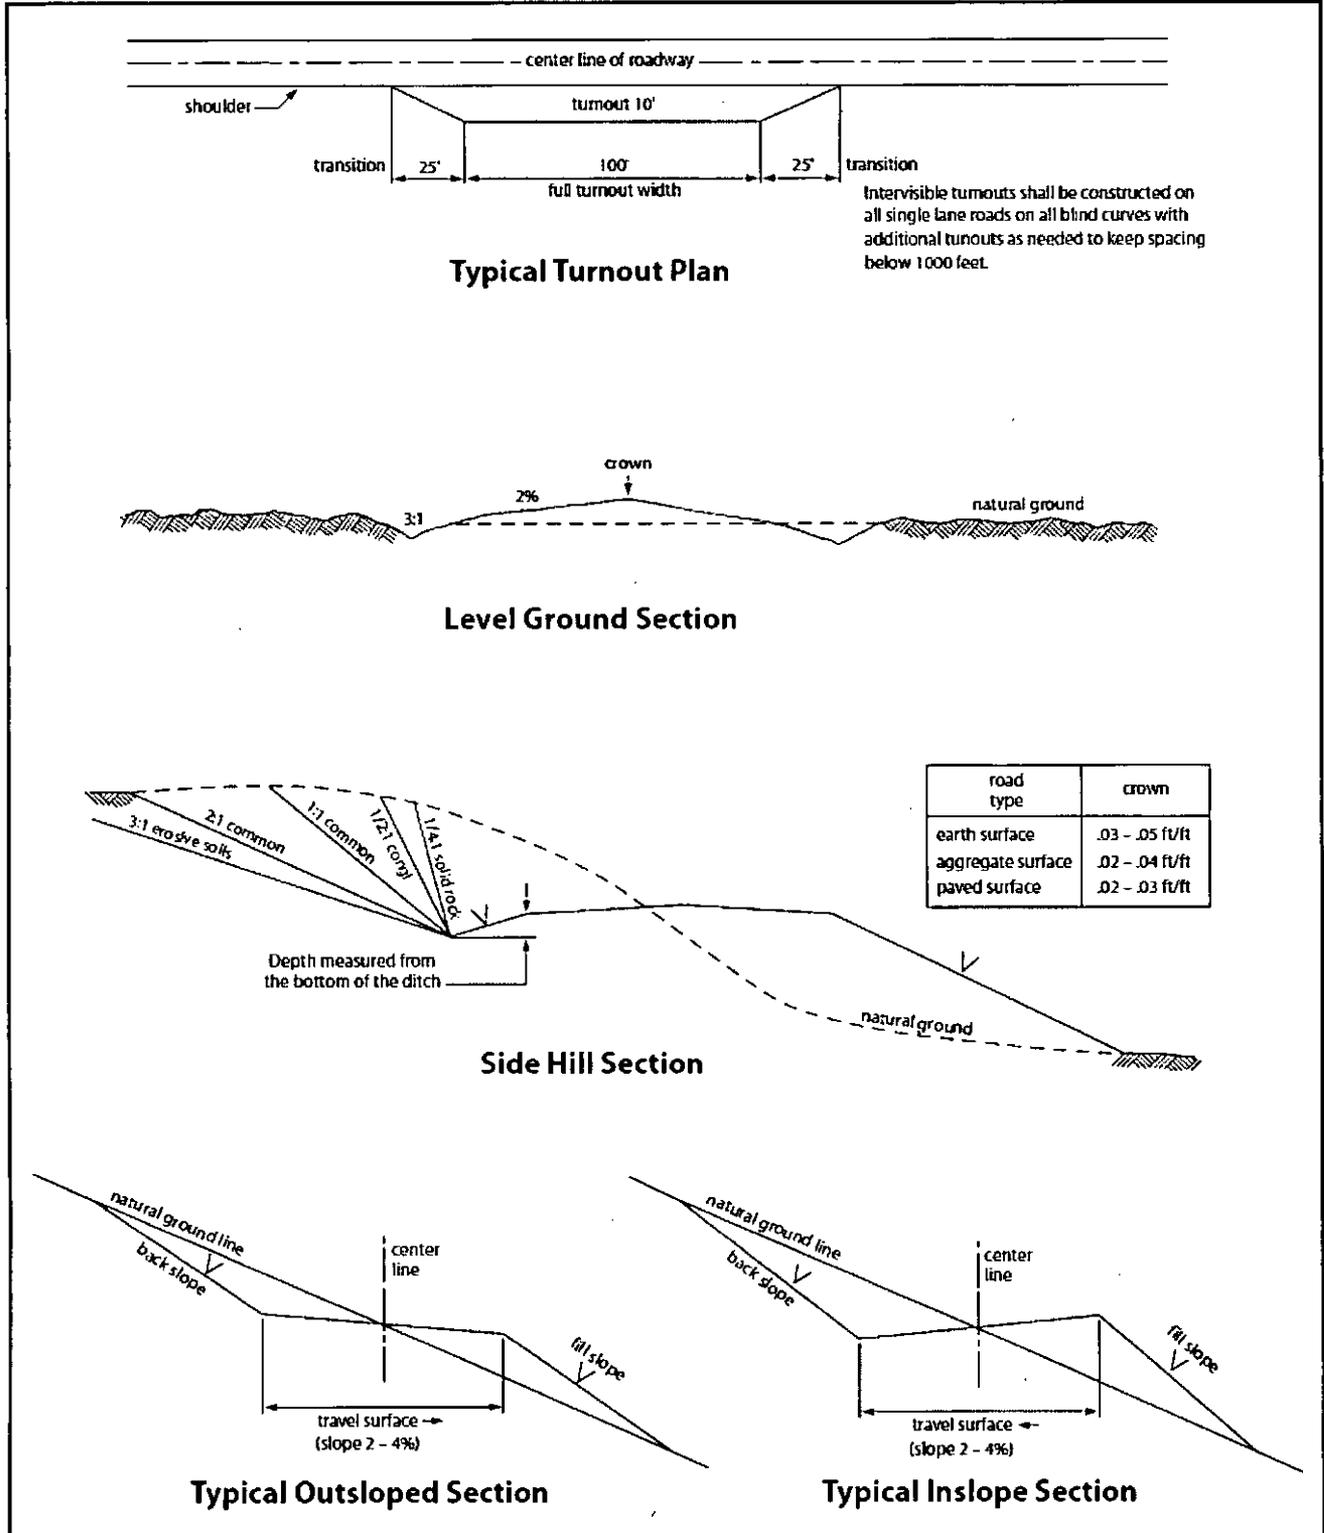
Cross-sections and plans for typical road sections representative of BLM resource or FS local and higher-class roads.
